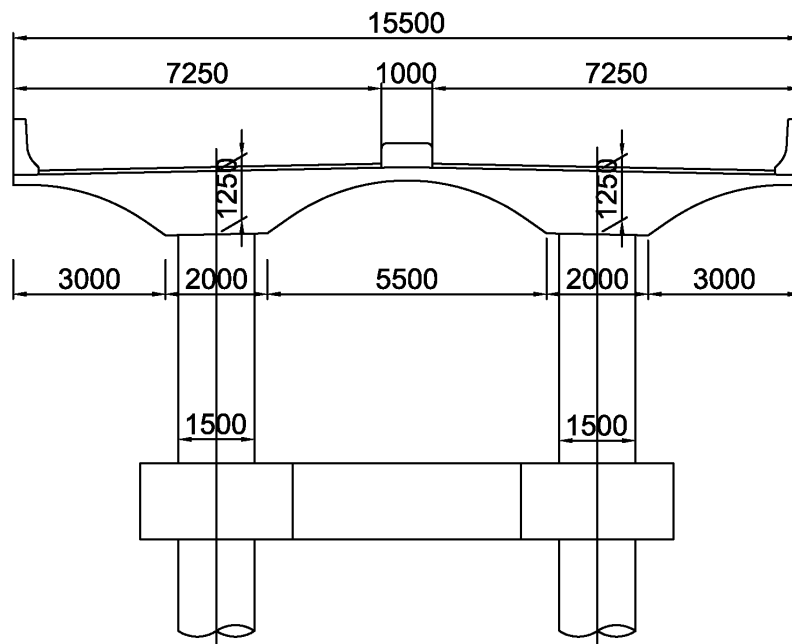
Typical Interchange Ramp A (2-way) Bridge (PC Solid Slab L=25 m)
